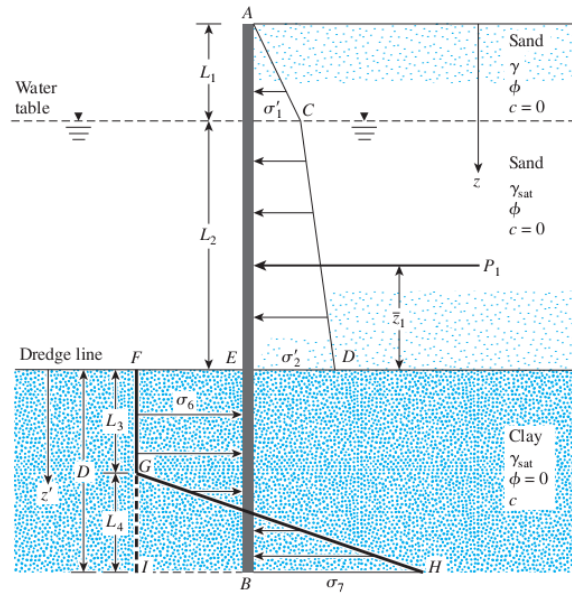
Cantilever sheet pile penetrating clay. Case II
